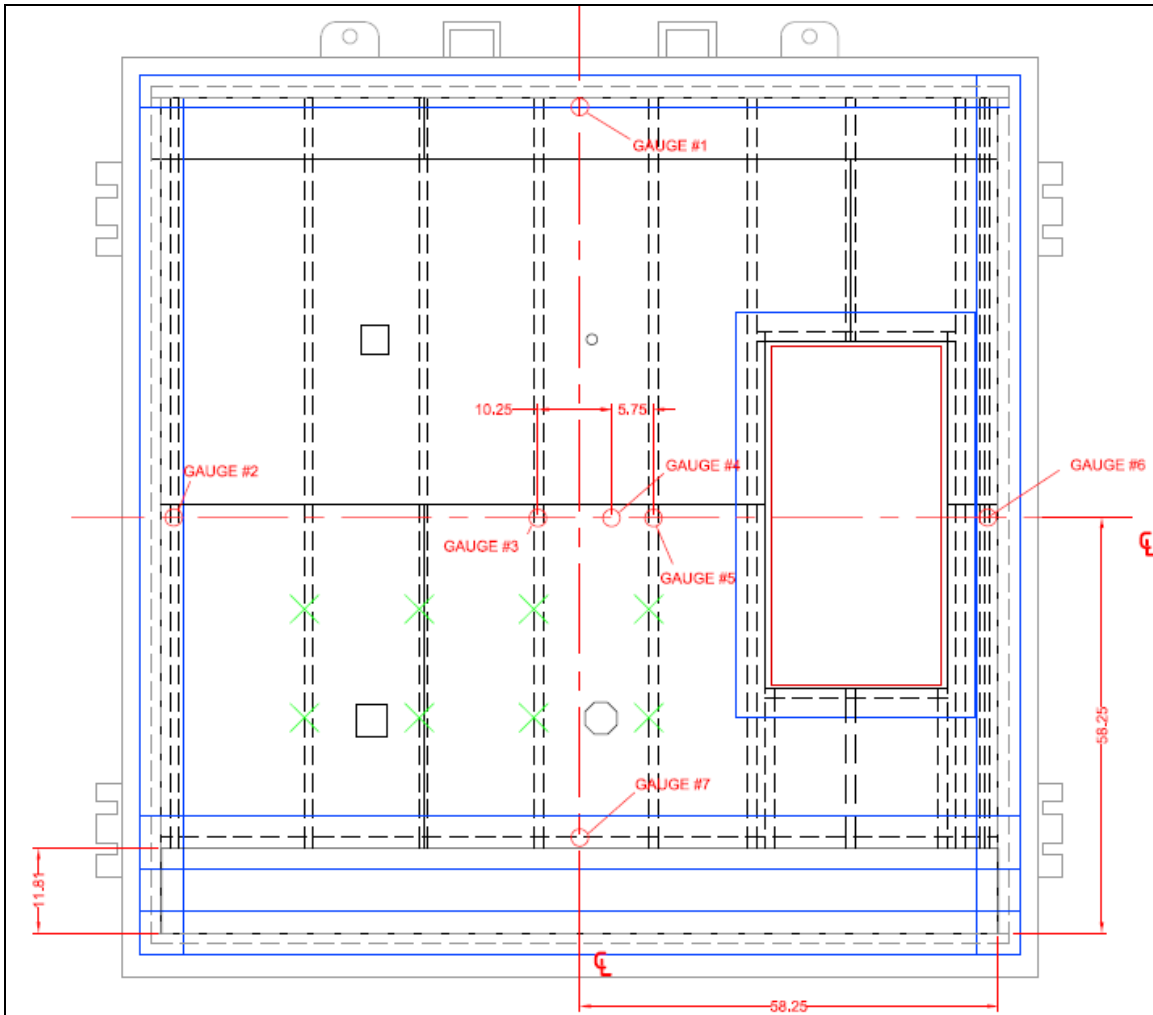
Exova Specimen 12-06-M0324-B Gauge Locations
